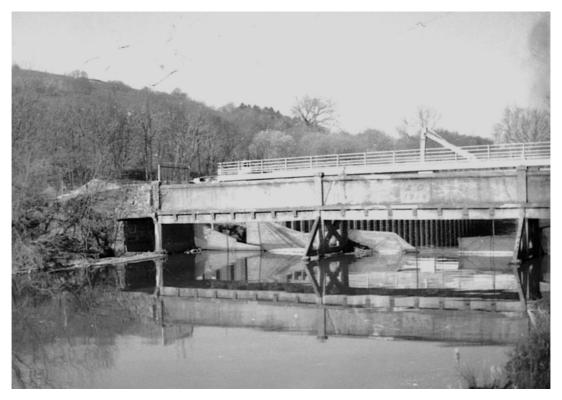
South-east-facing elevation of Sterne Bridge (MF SB01_12)
